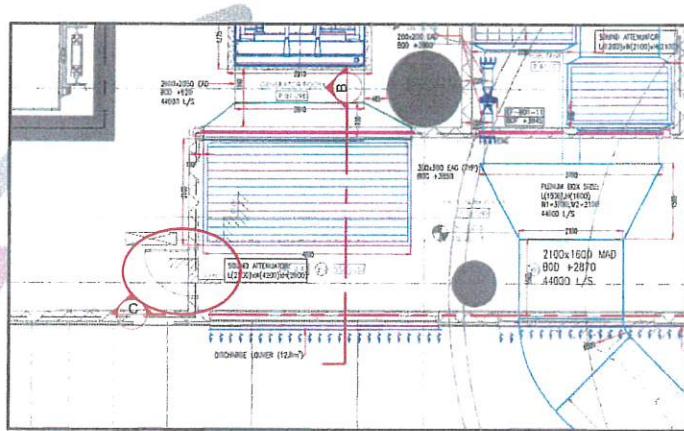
GENERATOR LAYOUT MARKED WITH CONCERNED DOOR ORIENTATION
